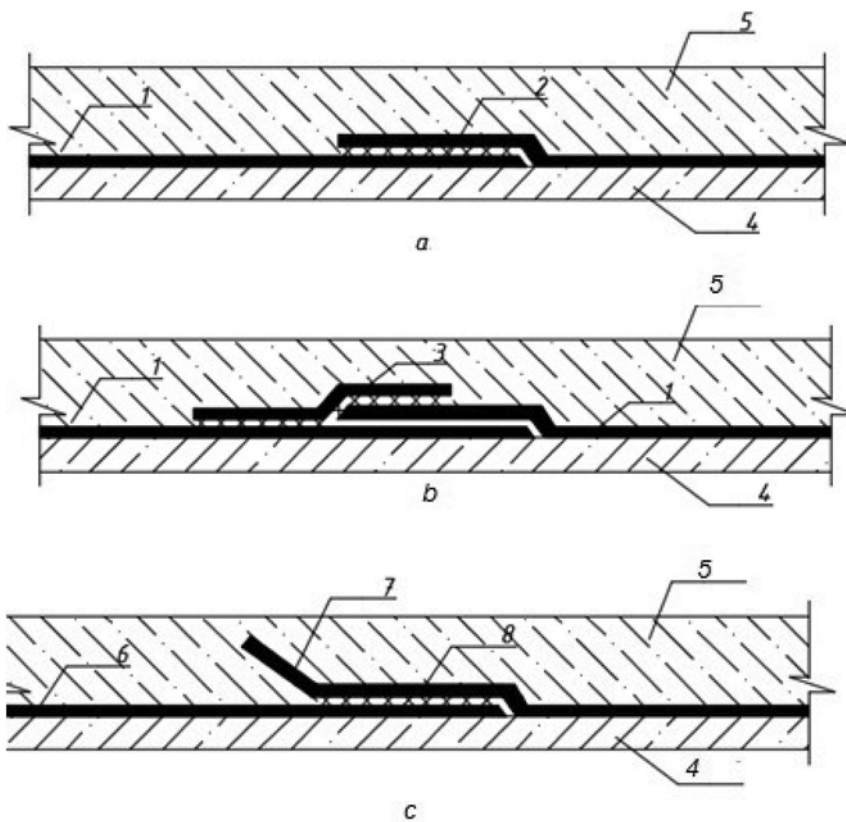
Waterproofing of the buckle (foundation) plate using factory-assembled 'free' laid three-layer sheet membranes and with adhesion to the freshly formed concrete. Laying diagram of three-layer sheet membranes with overlaps: a – self-adhesive longitudinal edge strips; b – transversal edges with overlapping adhesive sheets; c – Kolfen BSH bitumen-polymer-based membranes with overlapping longitudinal edges; 1 – three-layer sheet membrane; 2 – process joint of self-adhesive longitudinal edge strips; 3 – overlapping adhesive sheet; 4 – concrete surface; 5 – gutter board, laid on the waterproofing coating; 6 – rolls of Kolfen BSH; 7 – edge piece for welding; 8 – self-adhesive edge piece (joining of transversal edges of Kolfen BSH is made only with overlapping of the welding edge).
